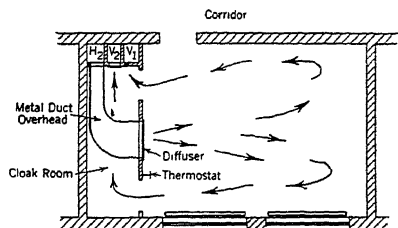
PLAN OF A CLASSROOM IN A SCHOOL VENTILATED BY A CENTRAL FAN
